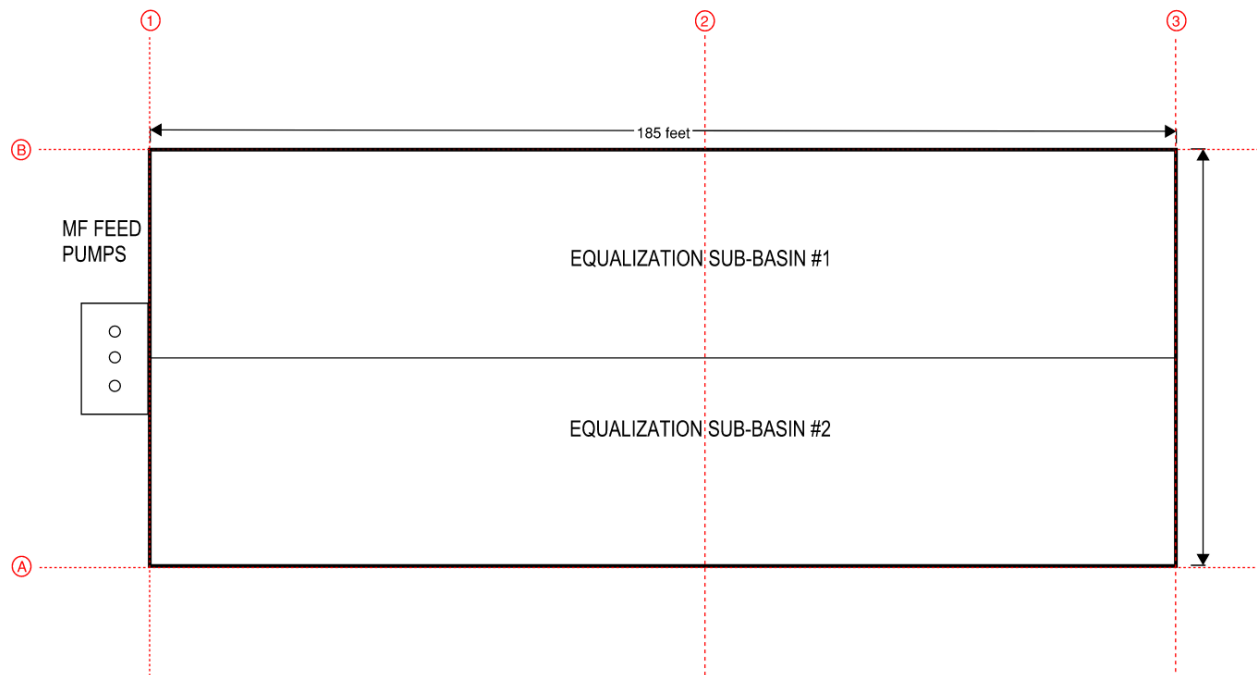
Plan Layout of the Below-Grade Equalization Tank
